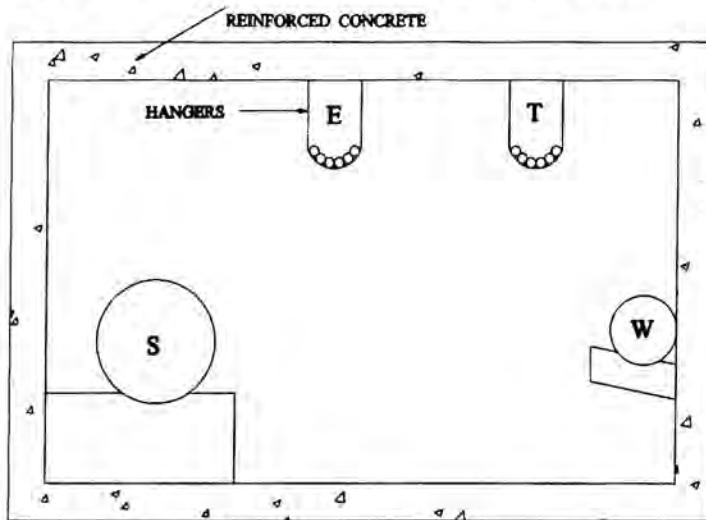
Cross-Section of Typical Subway Accommodating Utility Services
